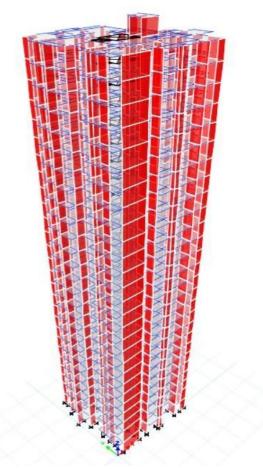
3D representation of Shear wall location in the structure in ETABS
